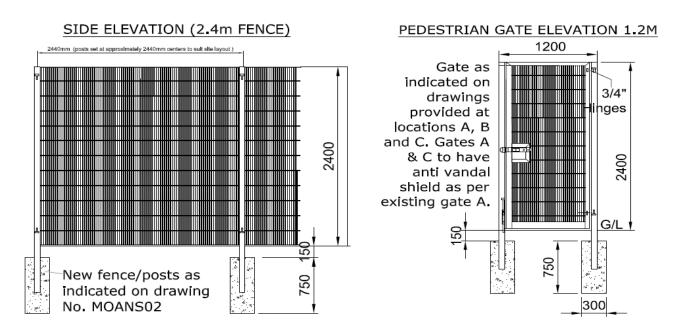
Proposed Fence and Pedestrian Gate Elevations
